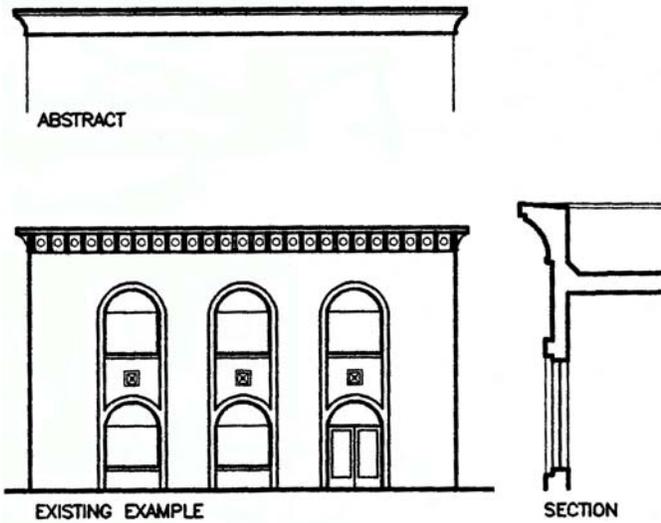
A contemporary interpretation of a classical parapet forms a single, strong, building cap.
